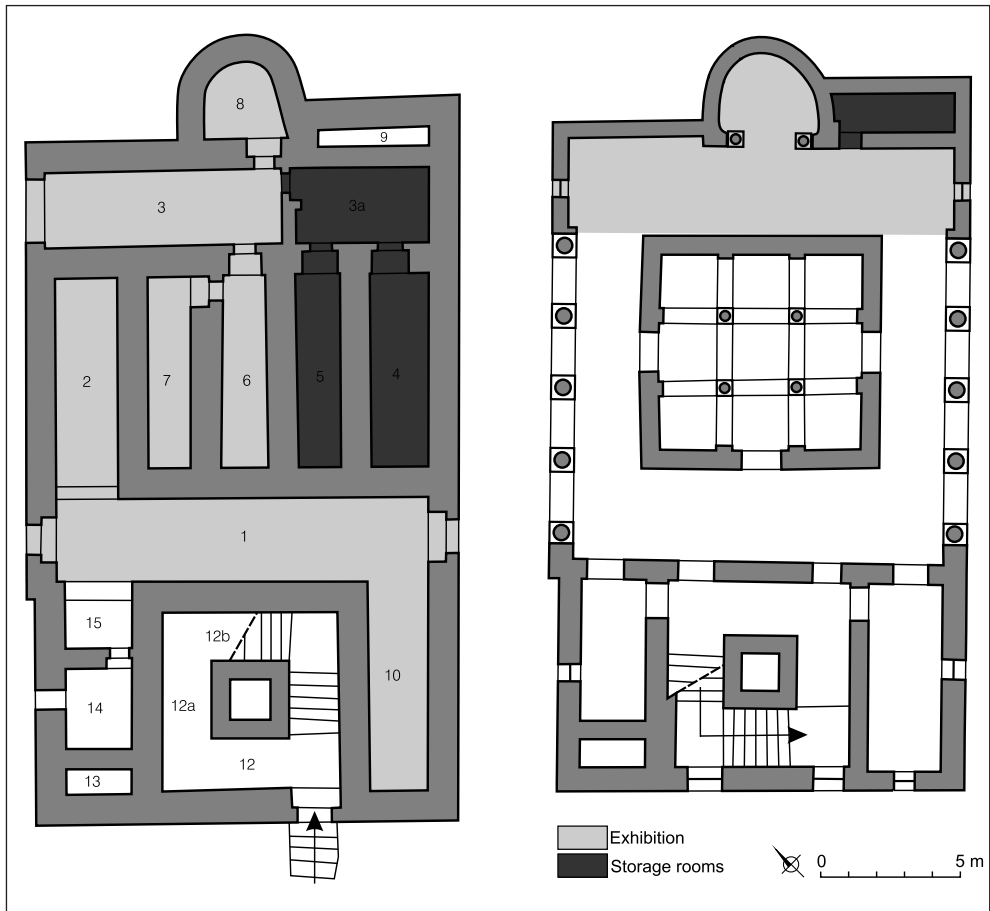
The Mosque, concept of interior adaptation, ground floor and first floor (Design W. Kolqatj, S. Medeksza)
